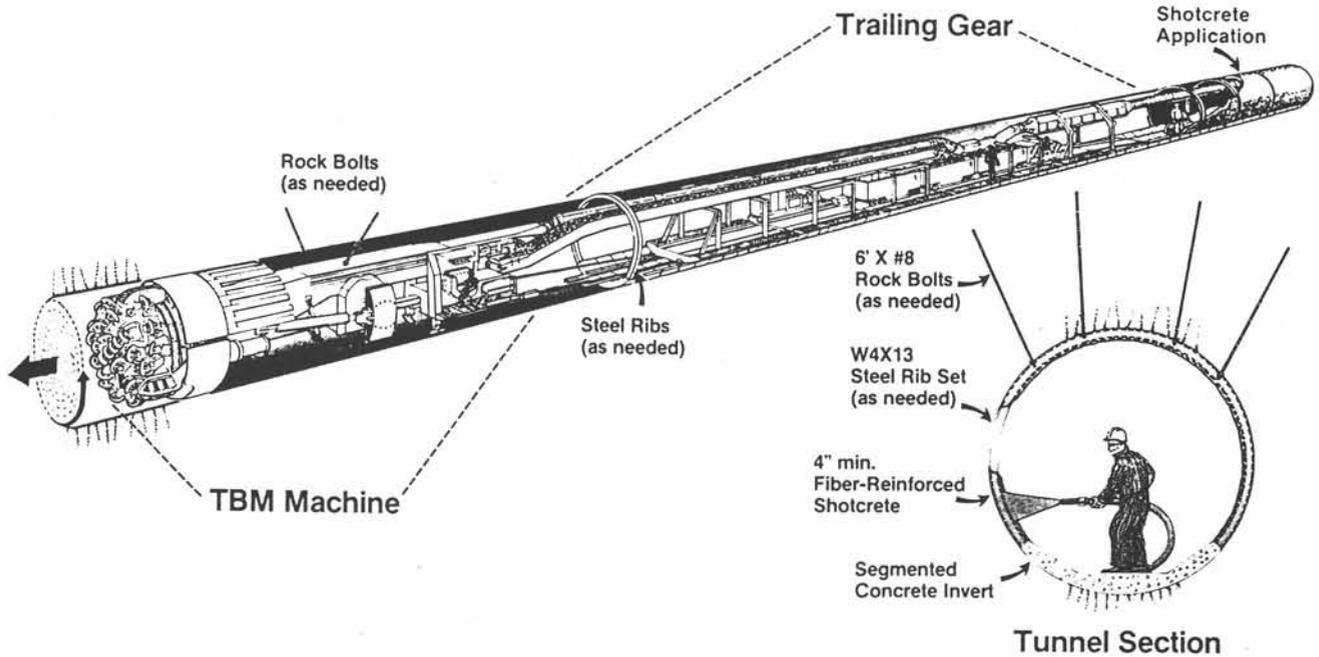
Sketch of the tunnel boring machine (TBM) used at the Spirit Lake tunnel. Courtesy of U.S. Army Corps of Engineers, Portland District.
